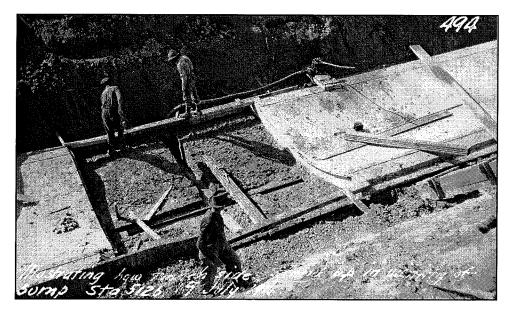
Box drain and offtake to drainage sump. (Construction Photograph No. 494)
